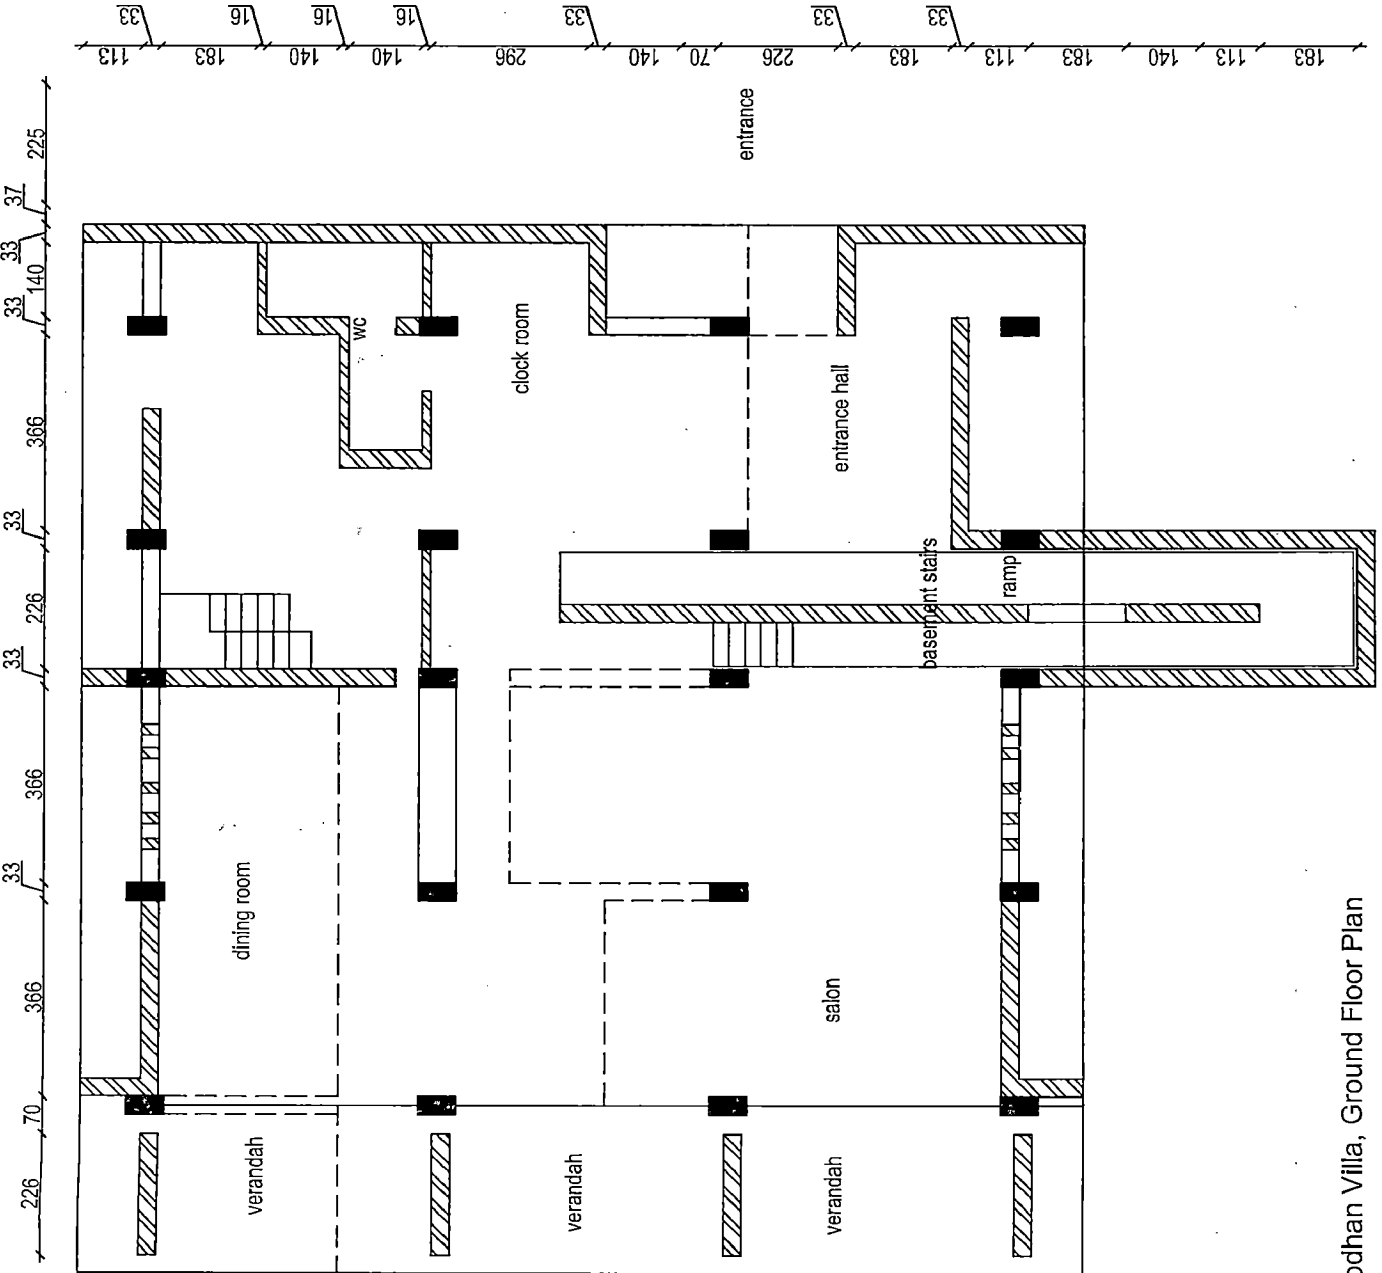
Shodhan Villa, Schematic Analysis Of Structural System Plan
